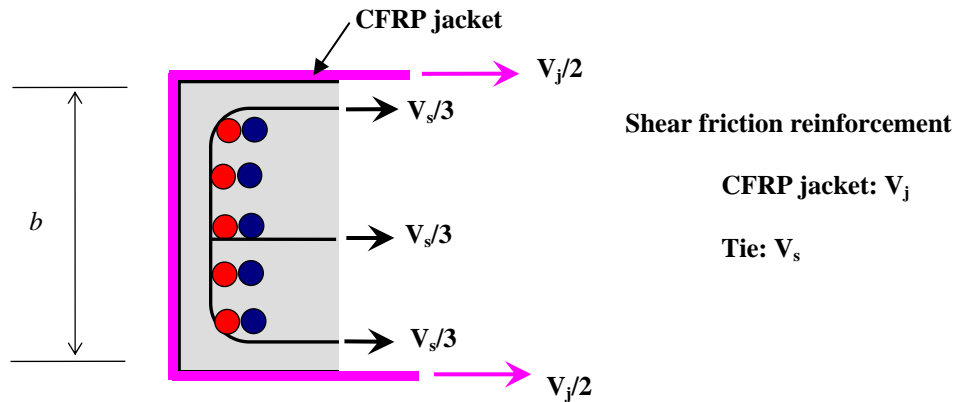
Shear load pattern for column confined with steel ties and CFRP jacketing (Kim, 2008)
